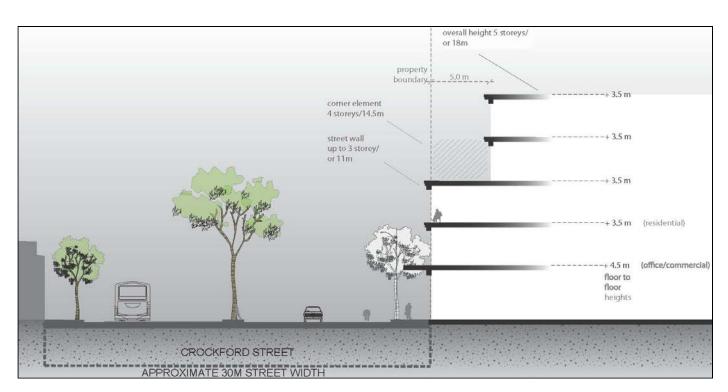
Section diagram showing proposed street wall, setbacks and overall building height.
